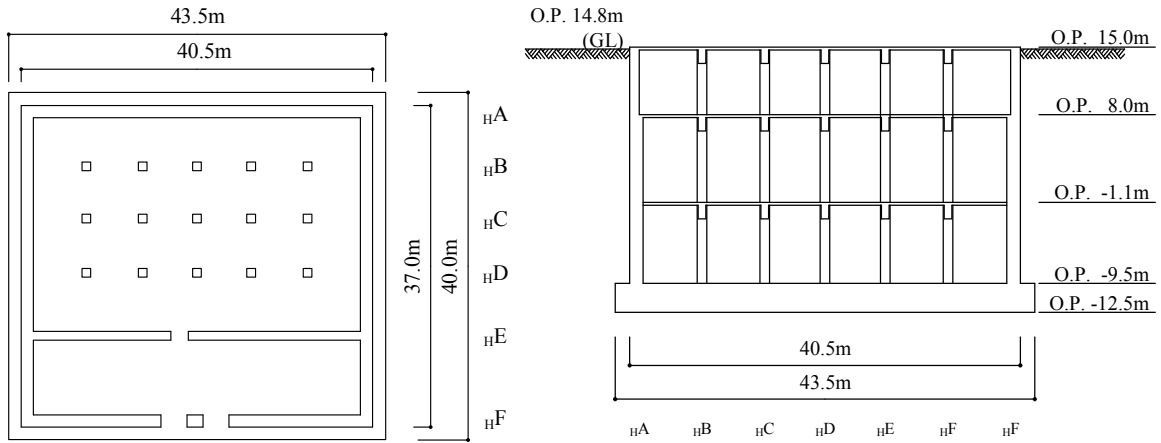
Plan view of the third floor of basement (left) and sectional view (right) of seawater heat exchanger building
